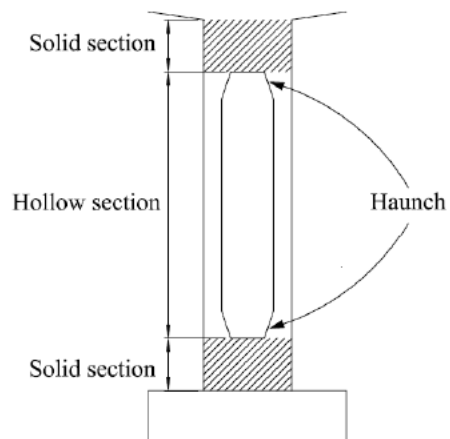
Design recommendations for reinforced concrete bridge columns with hollow section
